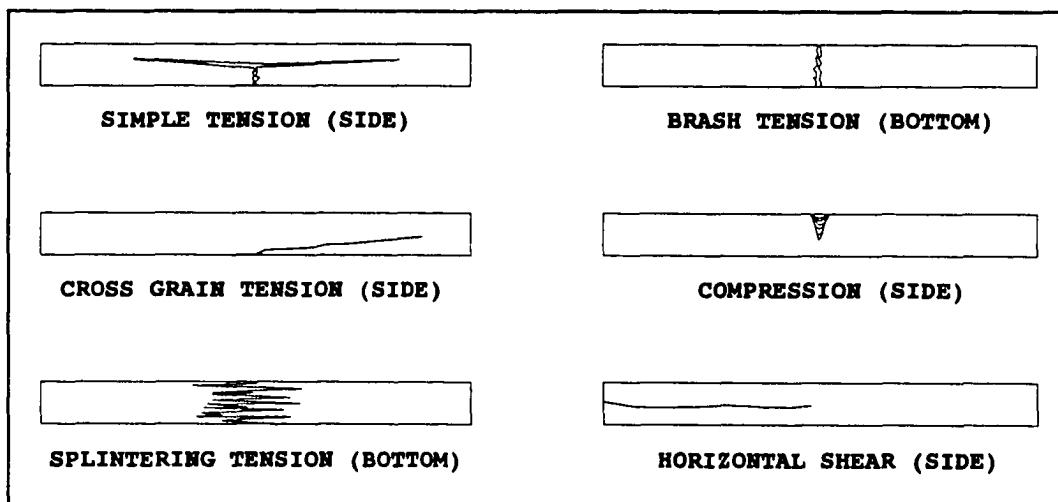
BEAM FAILURE PATTERNS
